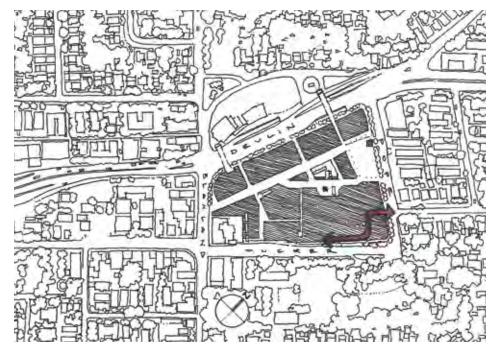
Vehicle Access Point from Pope Street (Approved as part of previous DAs)
